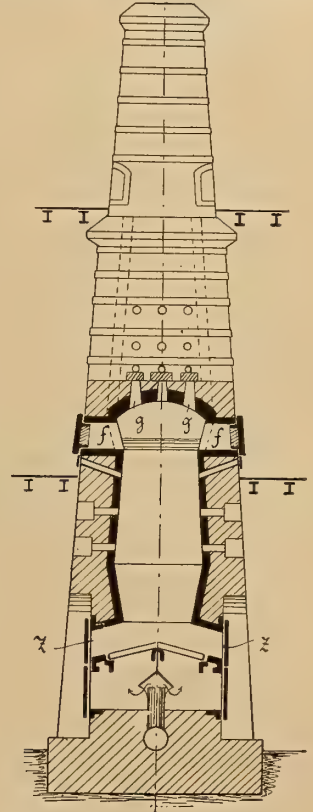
TRANSVERSE SECTION OF DIETZ CEMENT KILN
